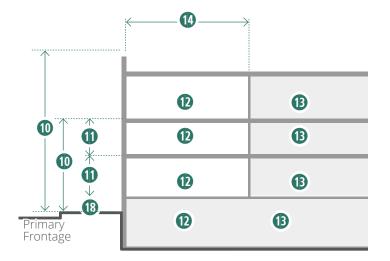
G-2. Workshop Building: Height & Use Requirements
